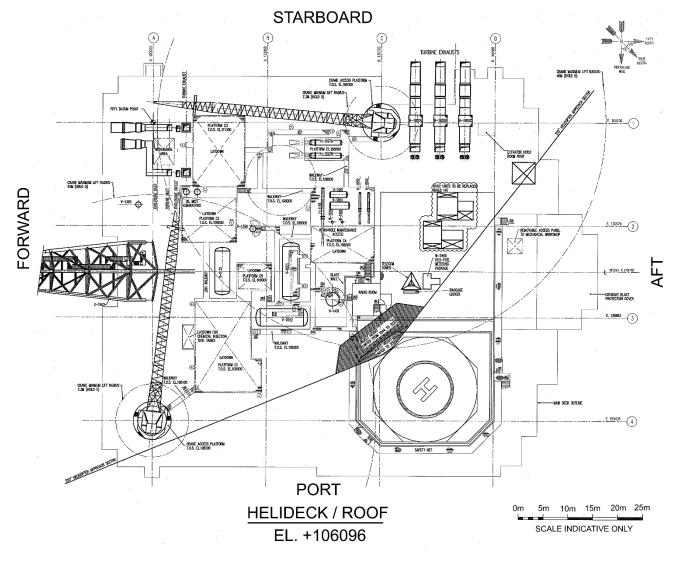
FPF-1 plan view – helideck / roof (EL. +106096)
